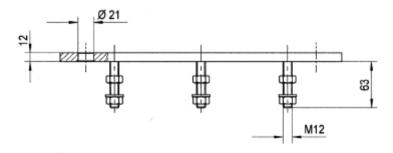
Dimension sheet for ceiling anchor plate CB 5105304 (dimensions are in mm)
